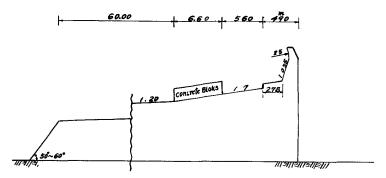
A Type of sea walls tested, section of a sea wall and shore at Suma, at Kobe, Japan.
